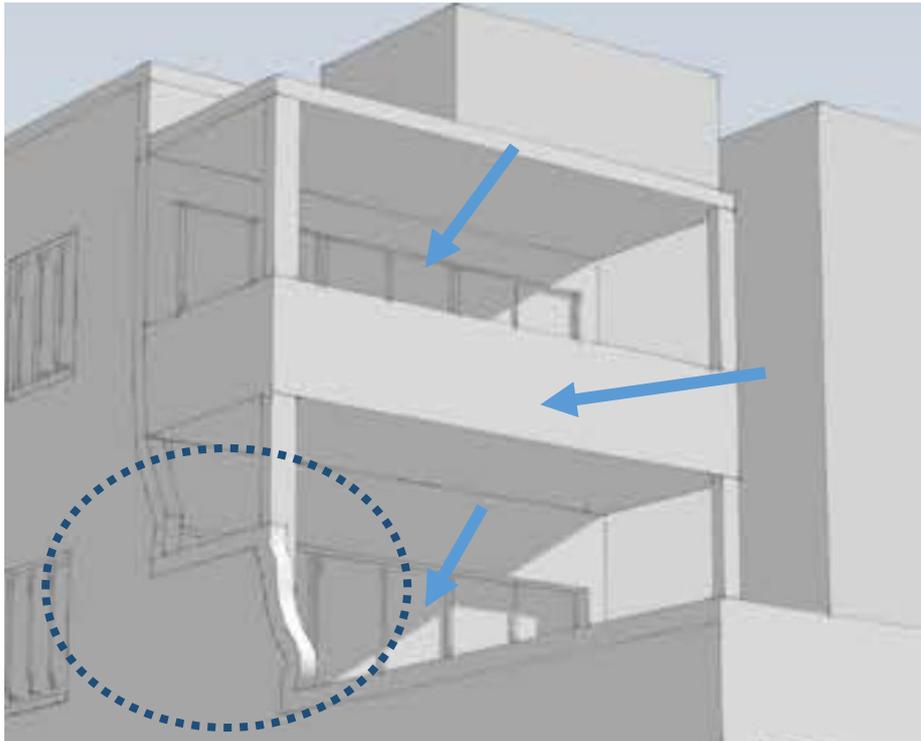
Illustrating extensive new glazed openings, glass balustrades, and impact to side horizontal parapet wall on the south elevation (bubbled).
